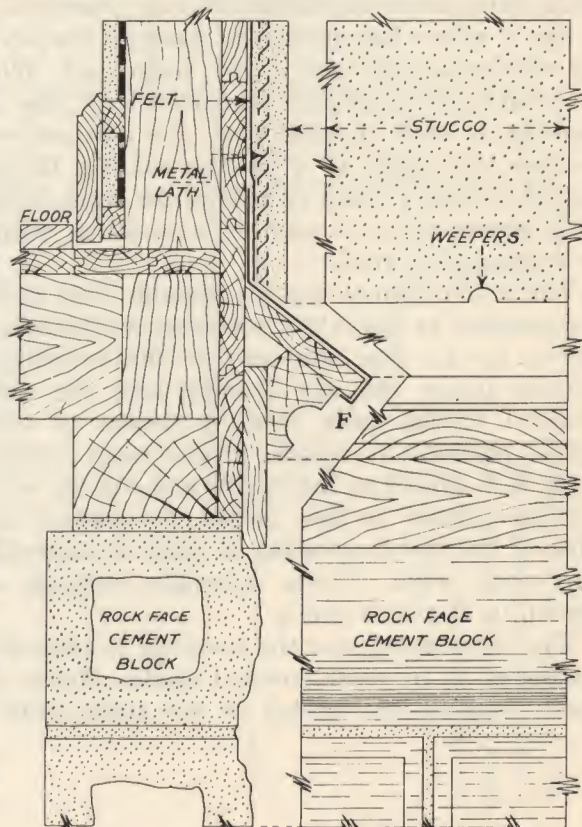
FLASHING WATER TABLE ON METAL LATH AND STUCCO WALL - SCALE $1\frac{1}{2}" = 1'-0"$
